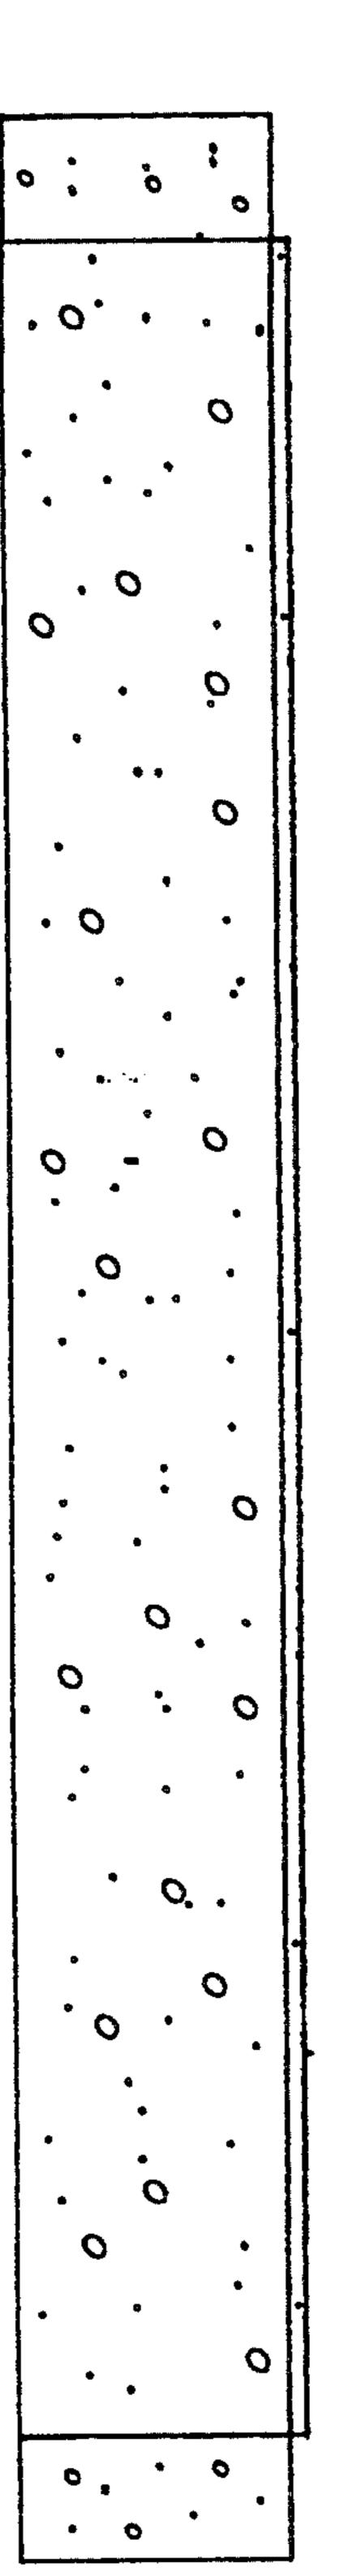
is an end view of the building component for a noise barrier retaining wall of the present invention; and,
